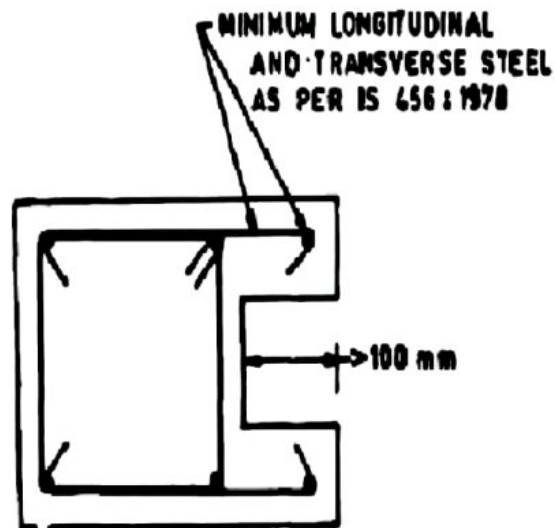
REINFORCEMENT REQUIREMENT FOR COLUMN WITH MORE THAN 100 mm PROJECTION BEYOND CORE
